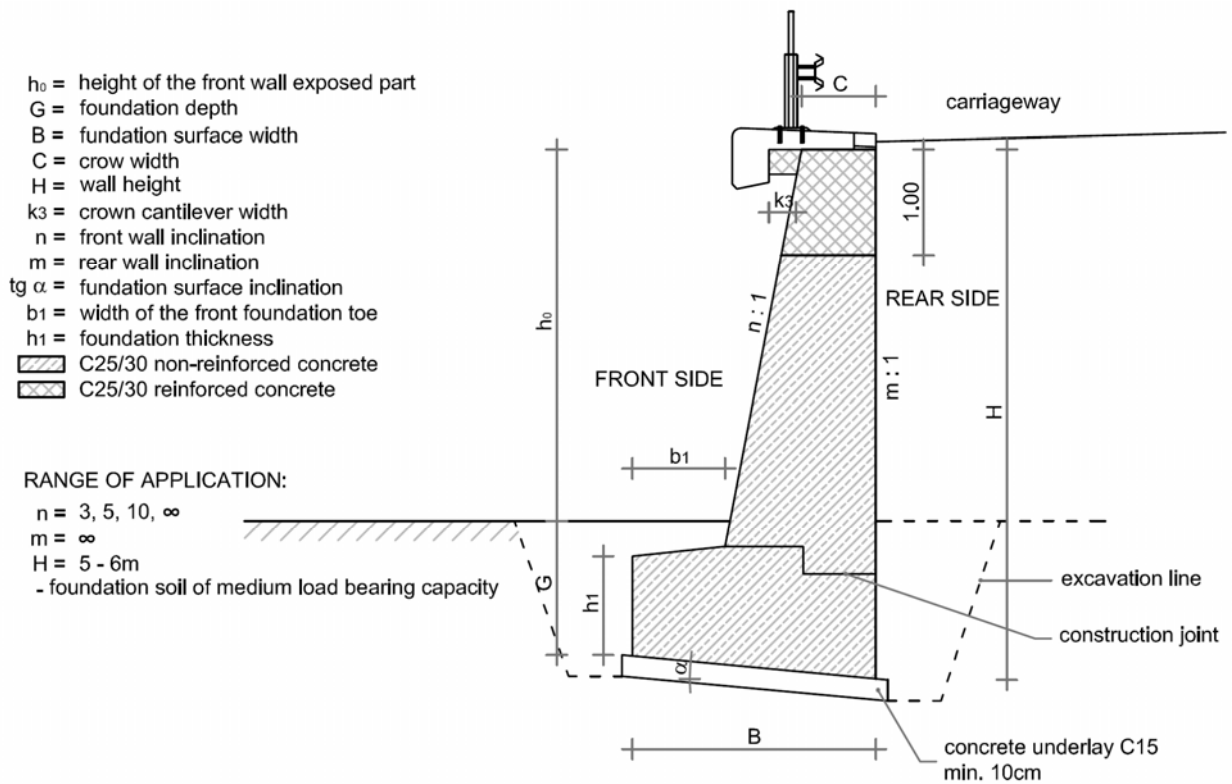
Concrete gravity supporting wall with a vertical rear wall
